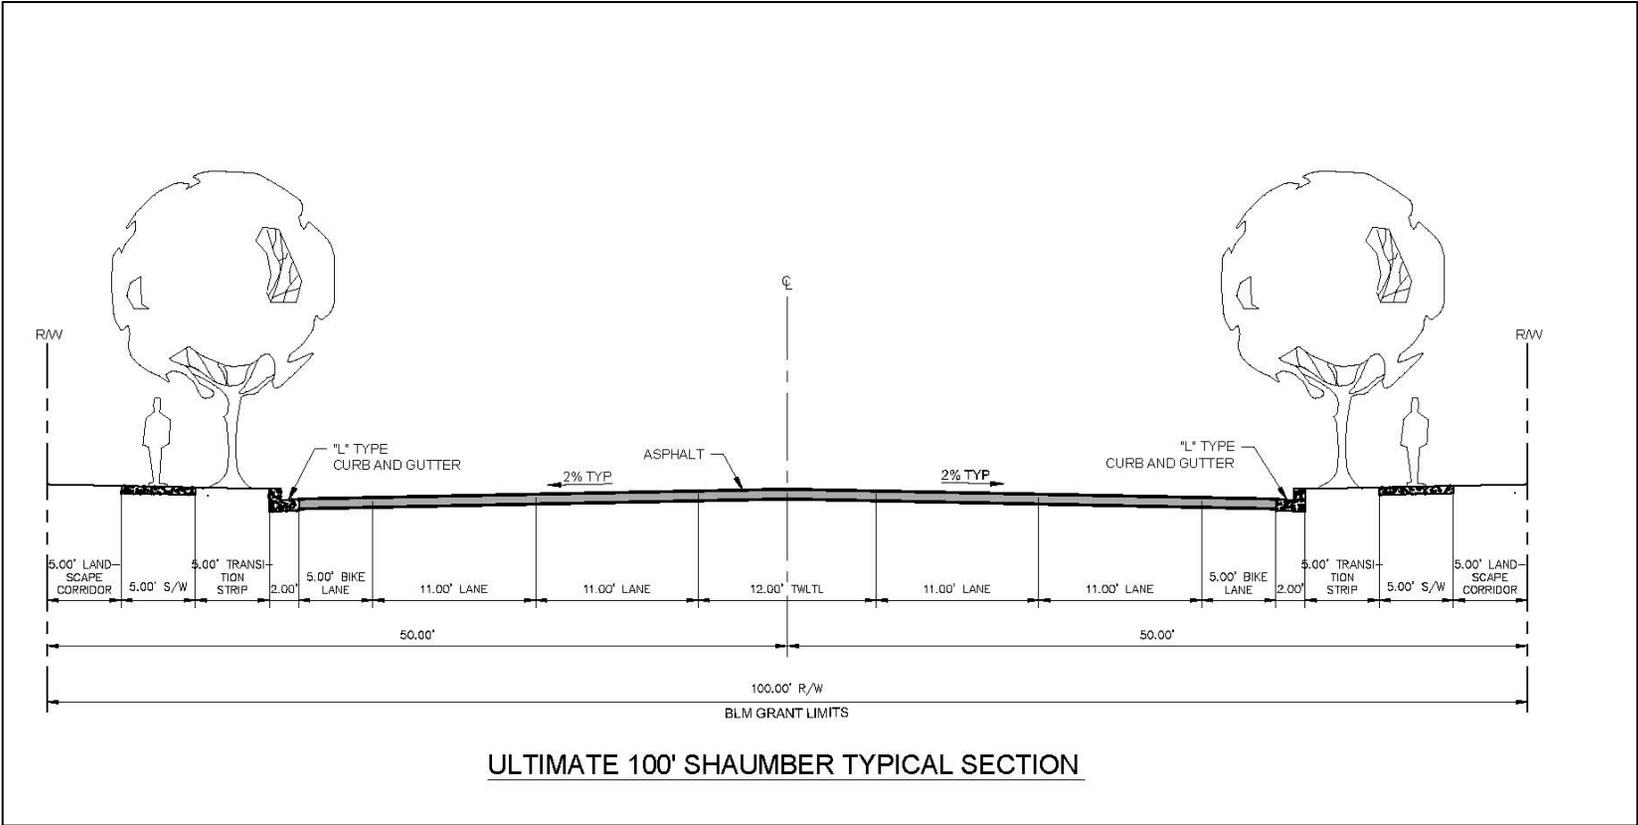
ROW Improvements – Ann Road to Tropical Parkway
